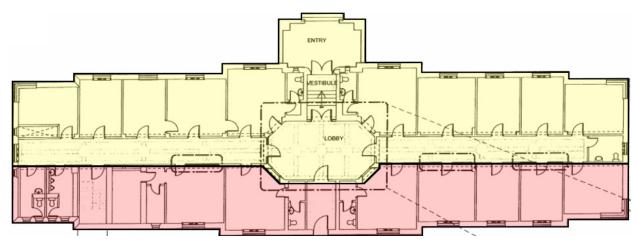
Diagram showing retained sections of the building for Option 2 'retention of north façade, lobby, rotunda, hallways, and rooms along the building's north façade'
